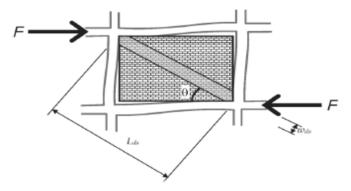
Equvivalent Diadonal Strut Of URM Infill Wall.
